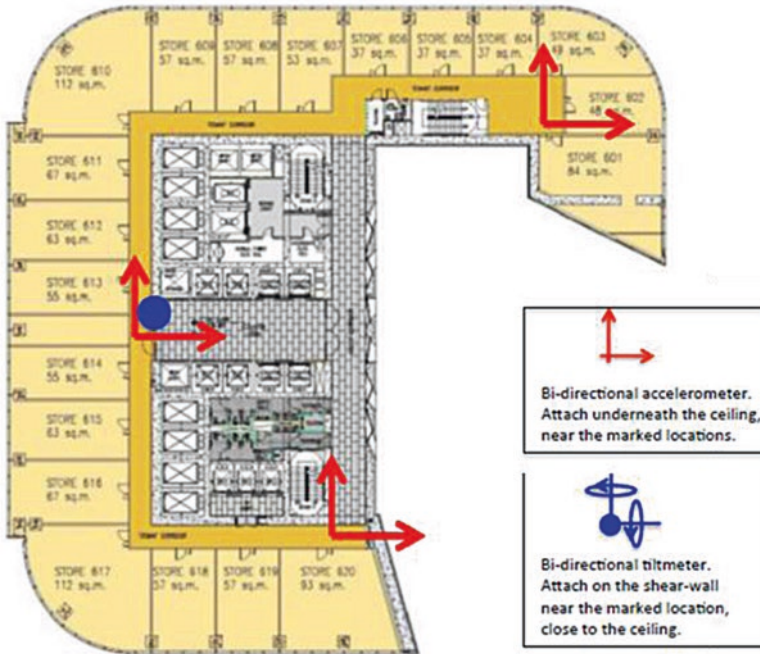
Proposed typical instrumentation of higher floors (ceiling of the sixth floor)
